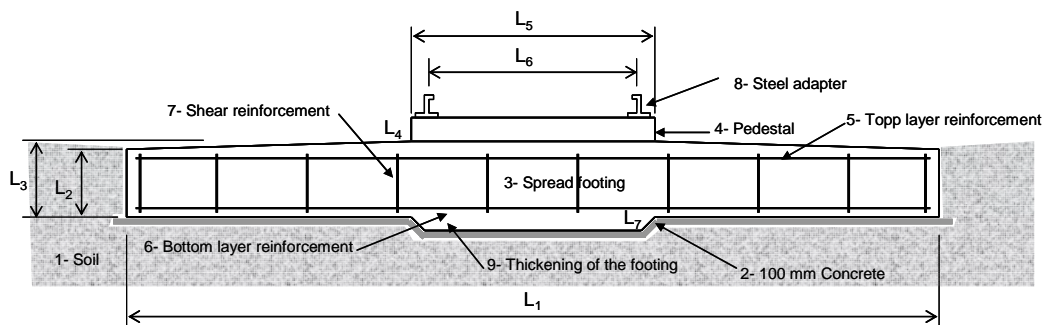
Principle drawing of a spread footing foundation, vertical cross section.
